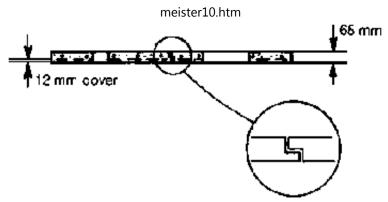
Reinforced concrete rectangular slab (for details of reinforcement see Table 7.1) (Section)
